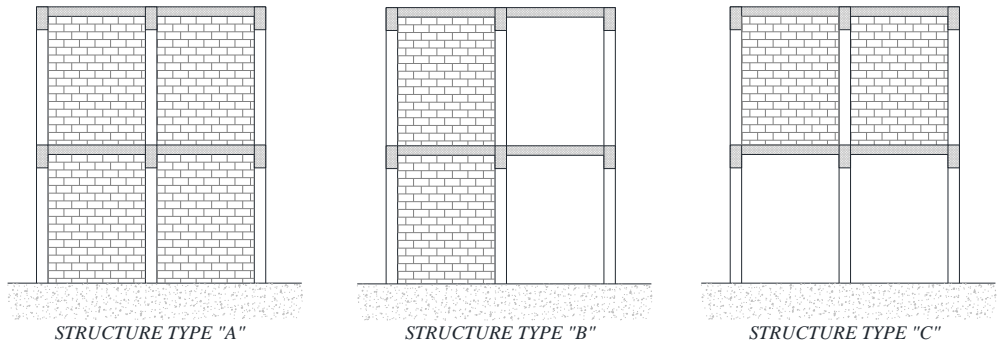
Alternative distributions of masonry infill within the RC frames considered as case study
